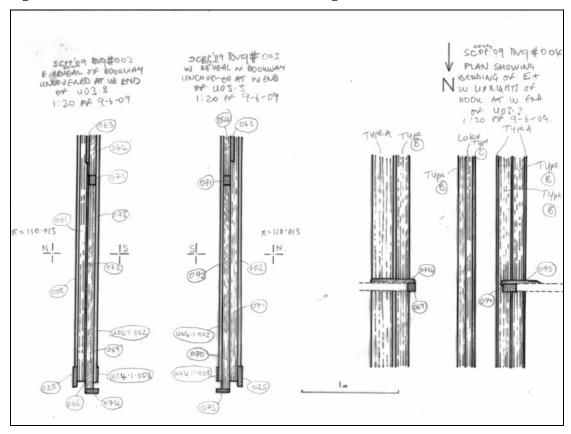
Details of unblocked doorway in U03.3 (Drawings 2, 3 & 4)
